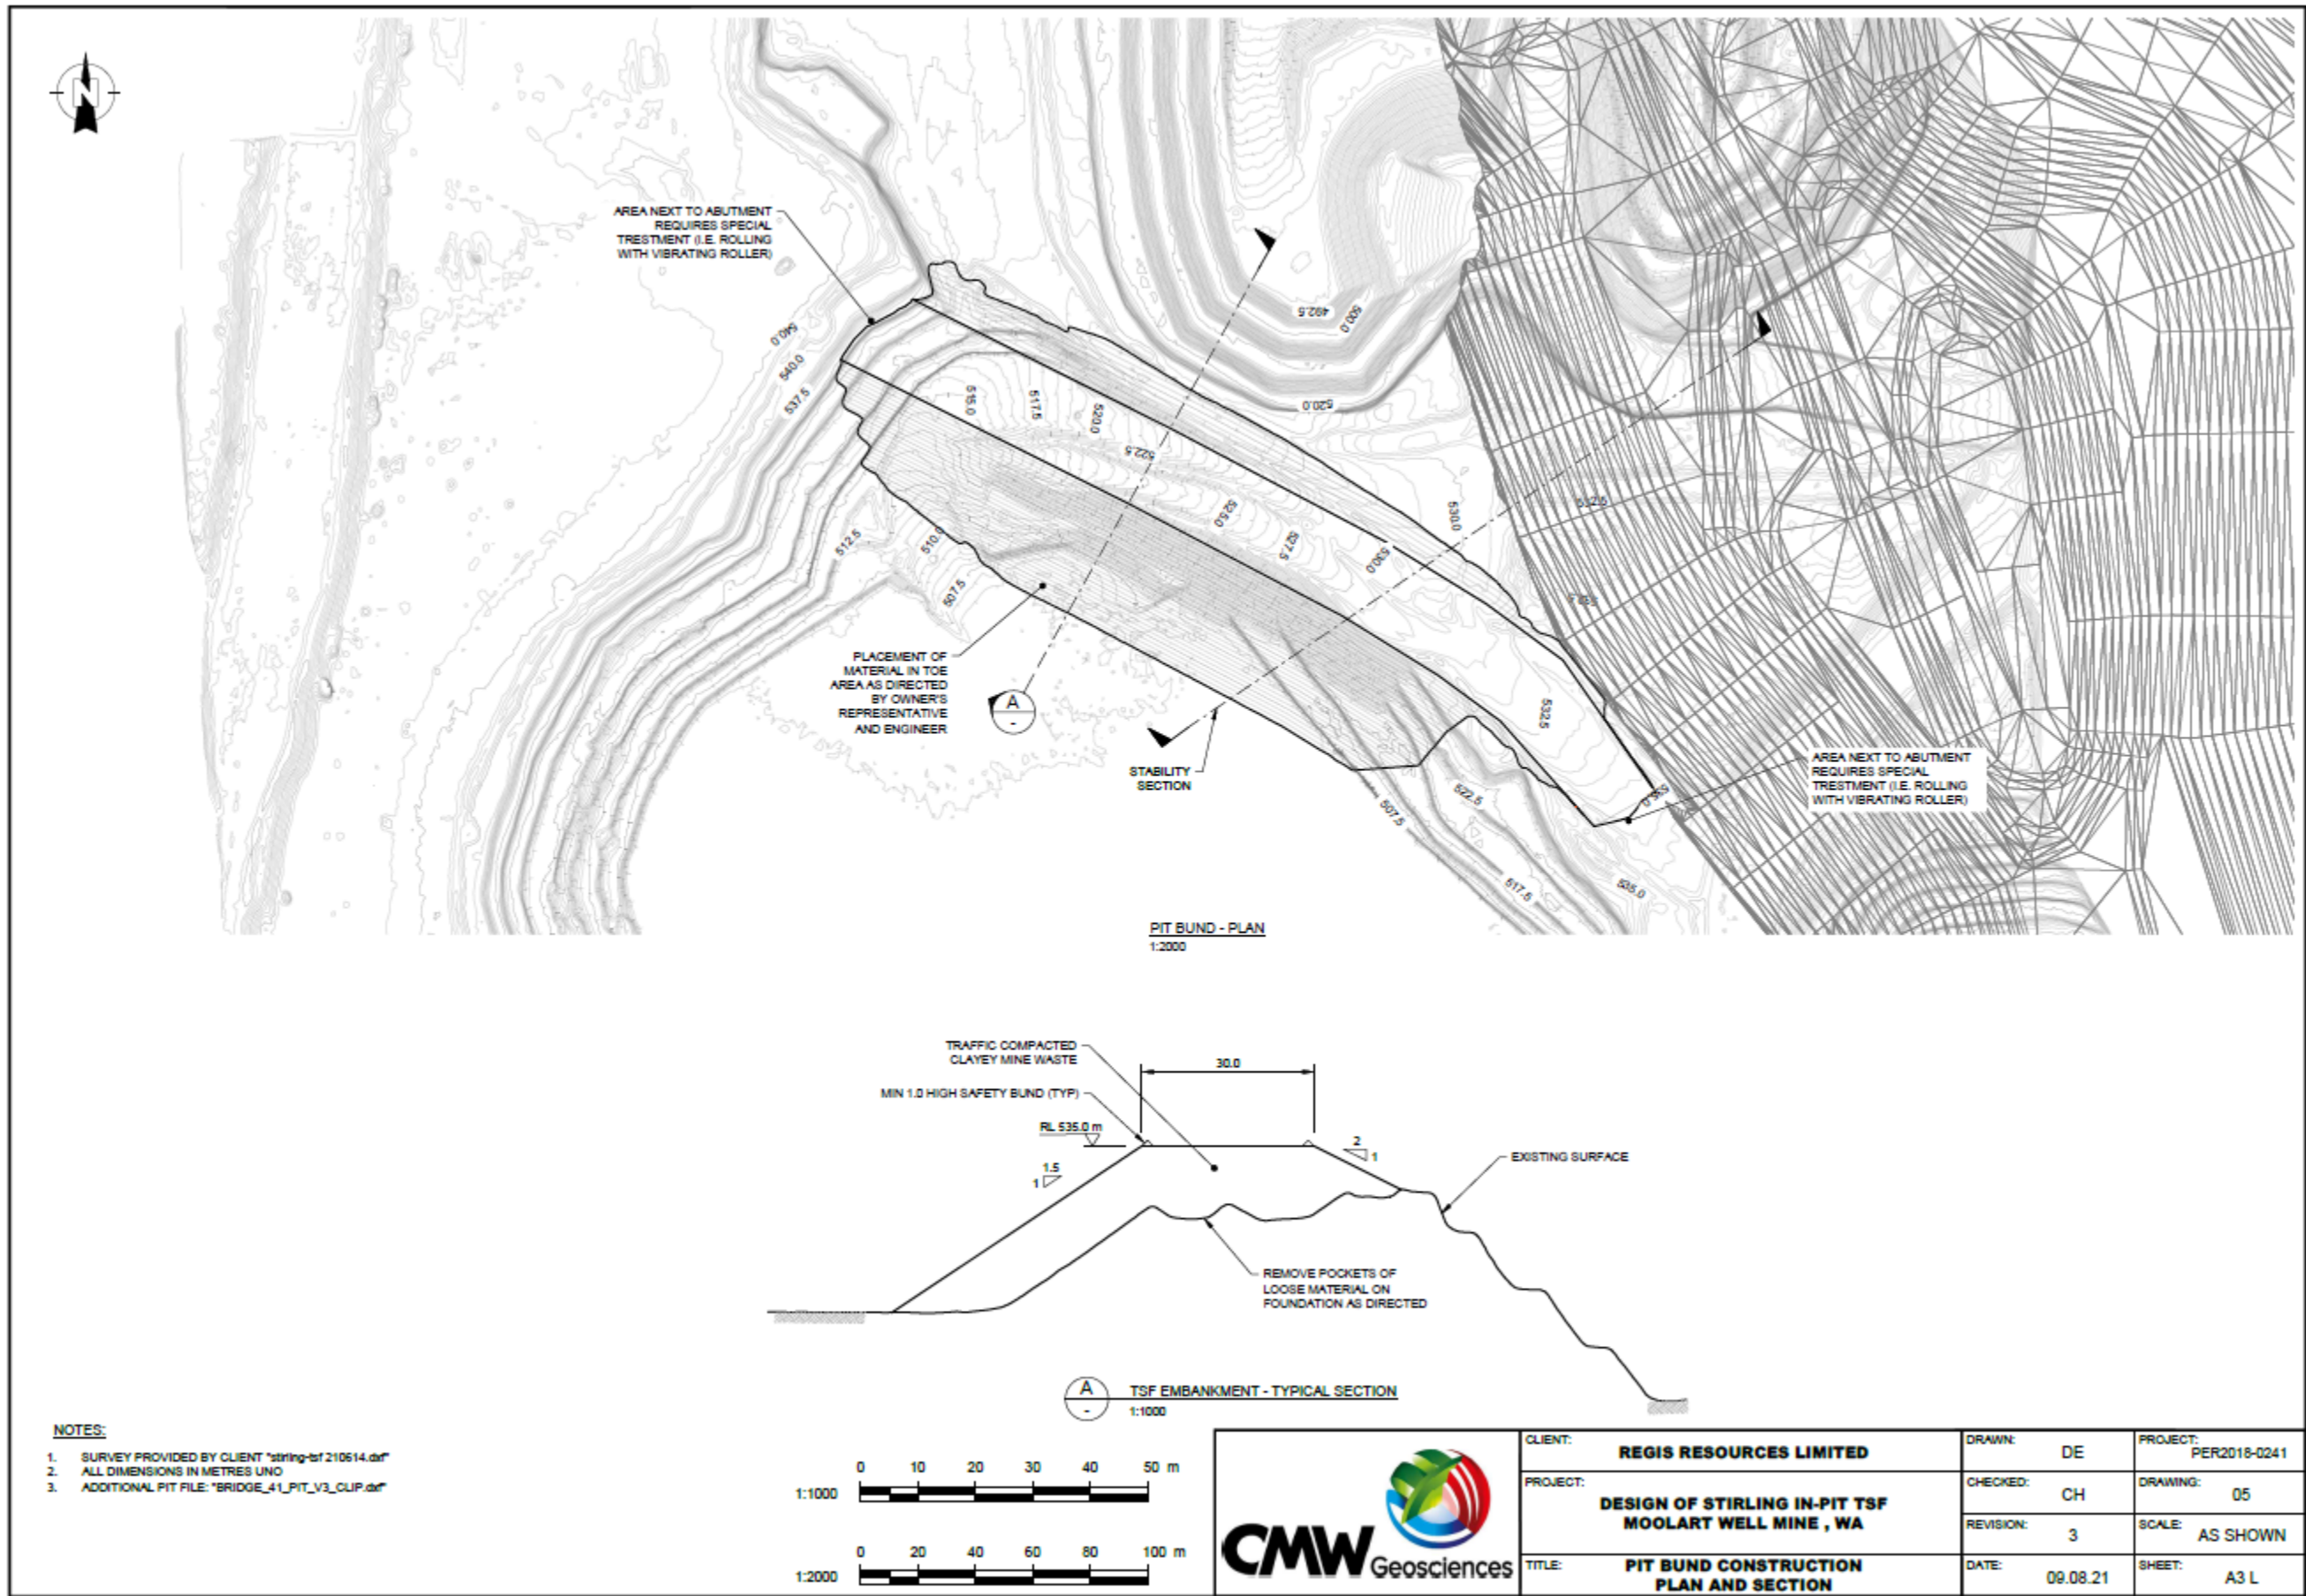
Cross section drawing of the proposed embankment raise of the Stirling in-pit TSF
